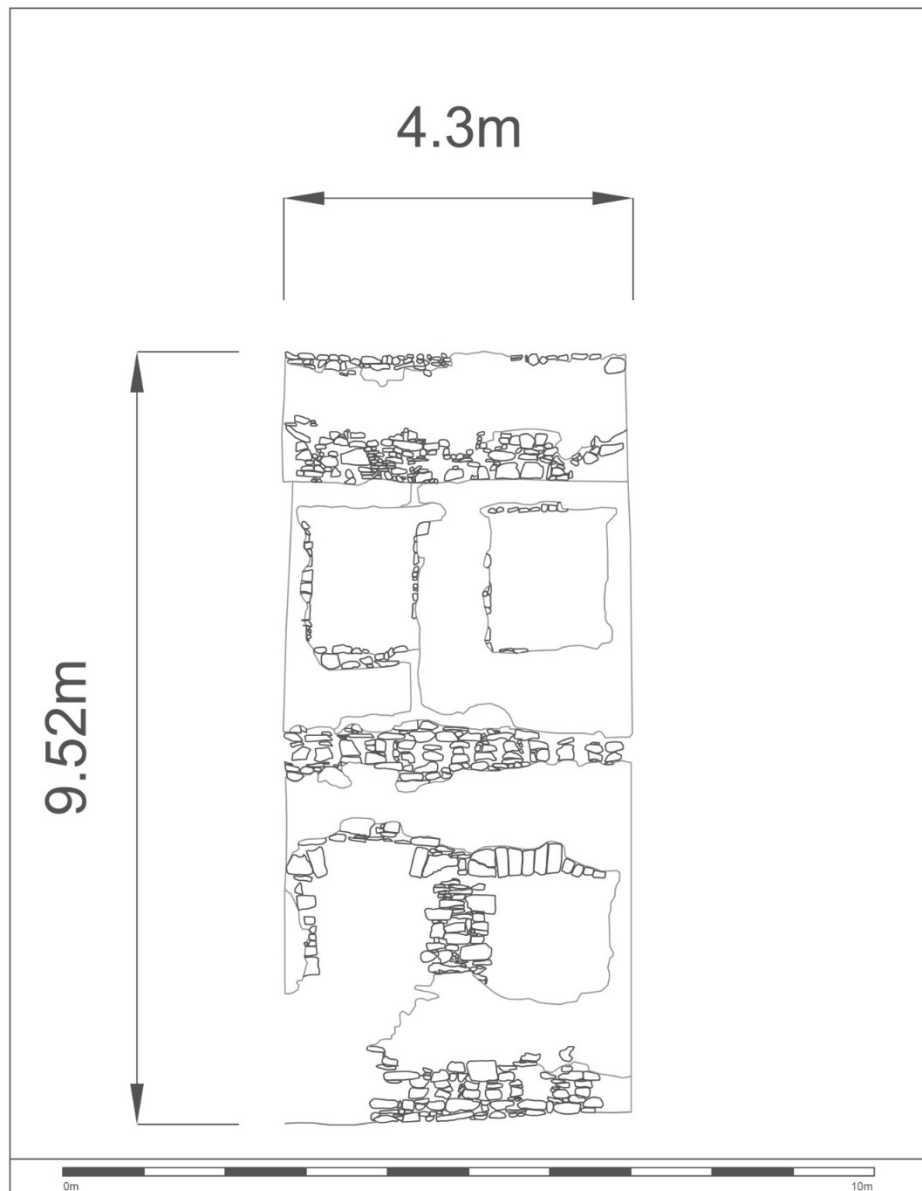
Internal elevation of the east wall of signal tower at Rathlee Signal Station.
